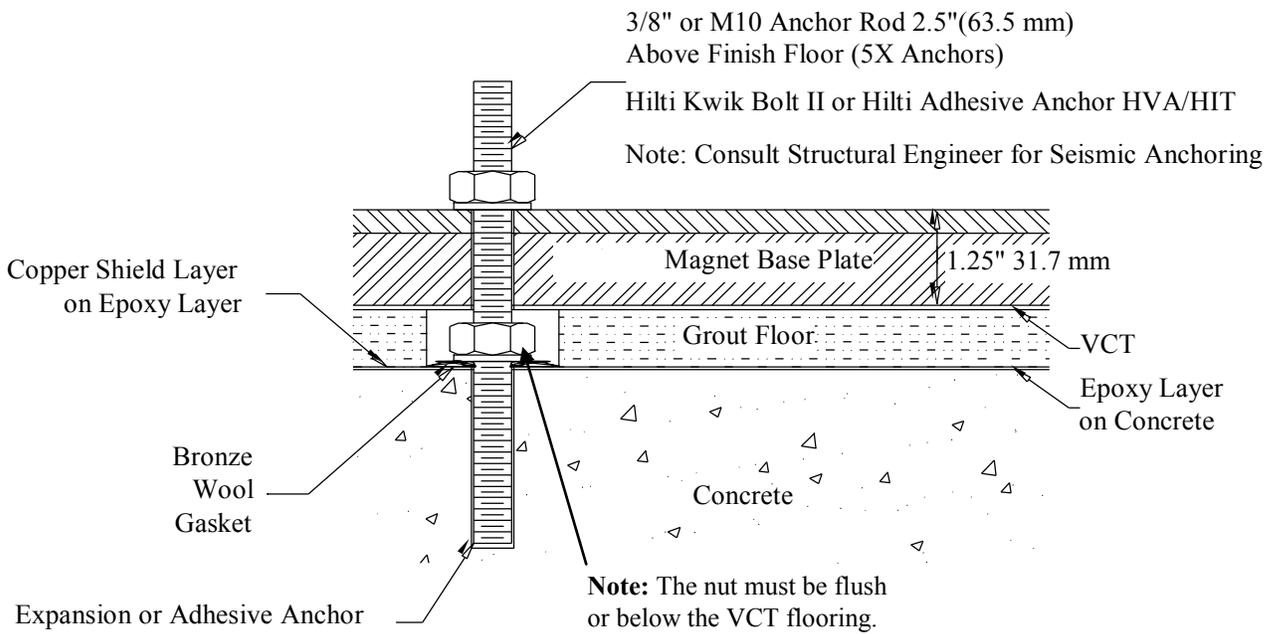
Typical Floor Prep Detail for Hilti Anchor
